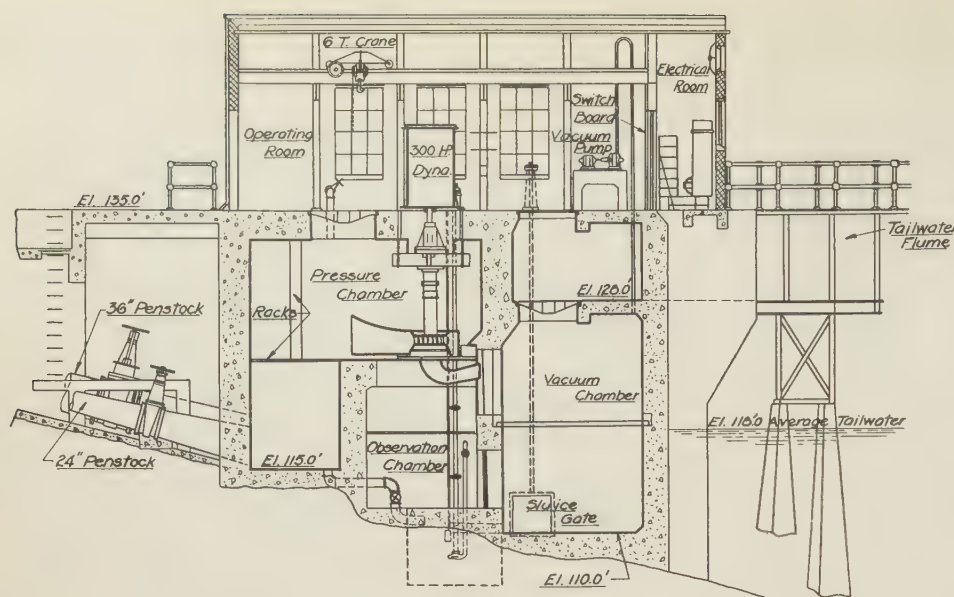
Longitudinal section of Holtwood hydraulic laboratory
